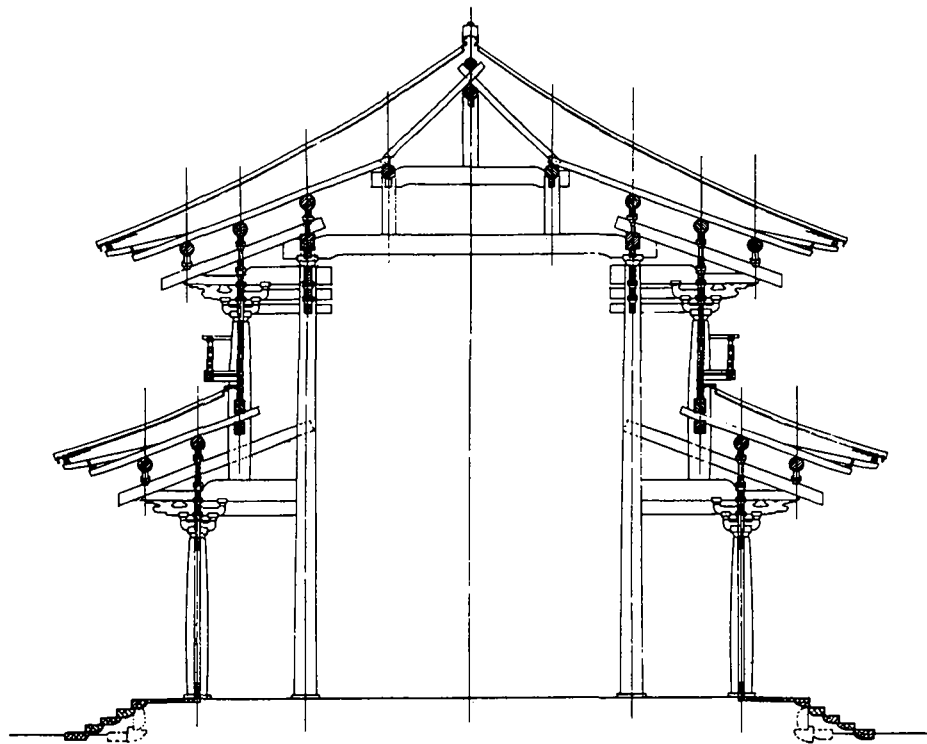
Reconstructed section of the image hall of Güm-gang-sa 金剛寺 金강사
